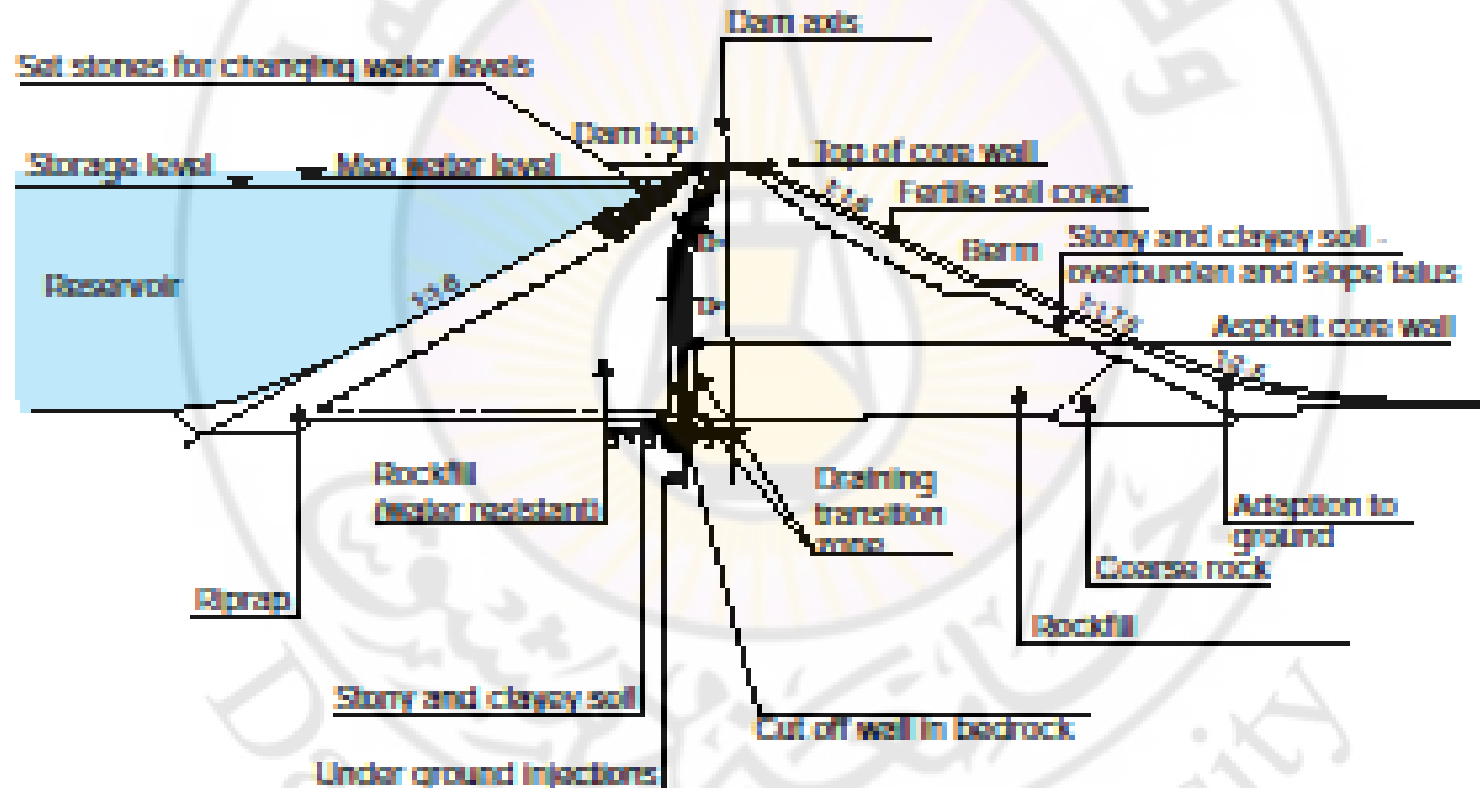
Typical cross-section of a dam with asphaltic concrete core wall
